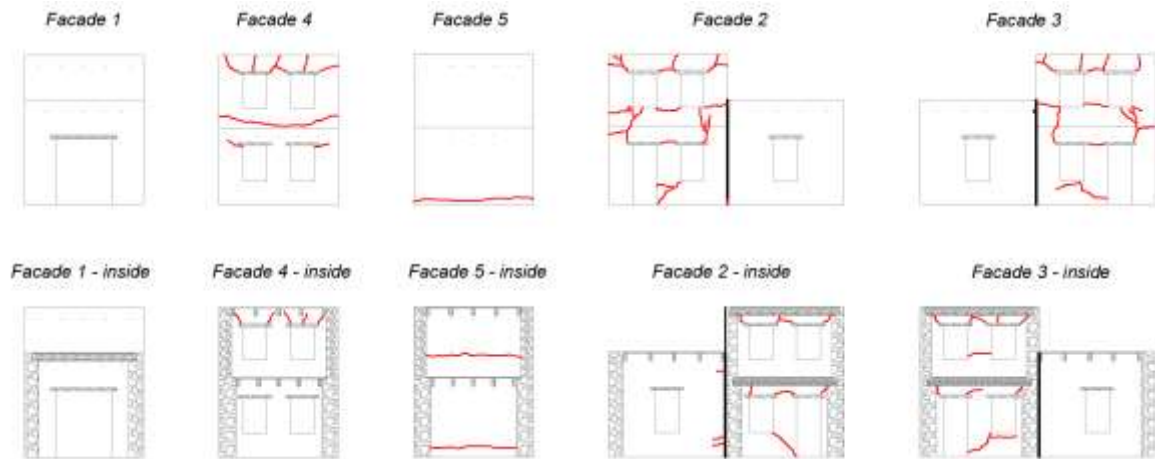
Crack maps after Run 2.1. Black color marks previous damage, and red new damage (Tomić et al. 2022a).
